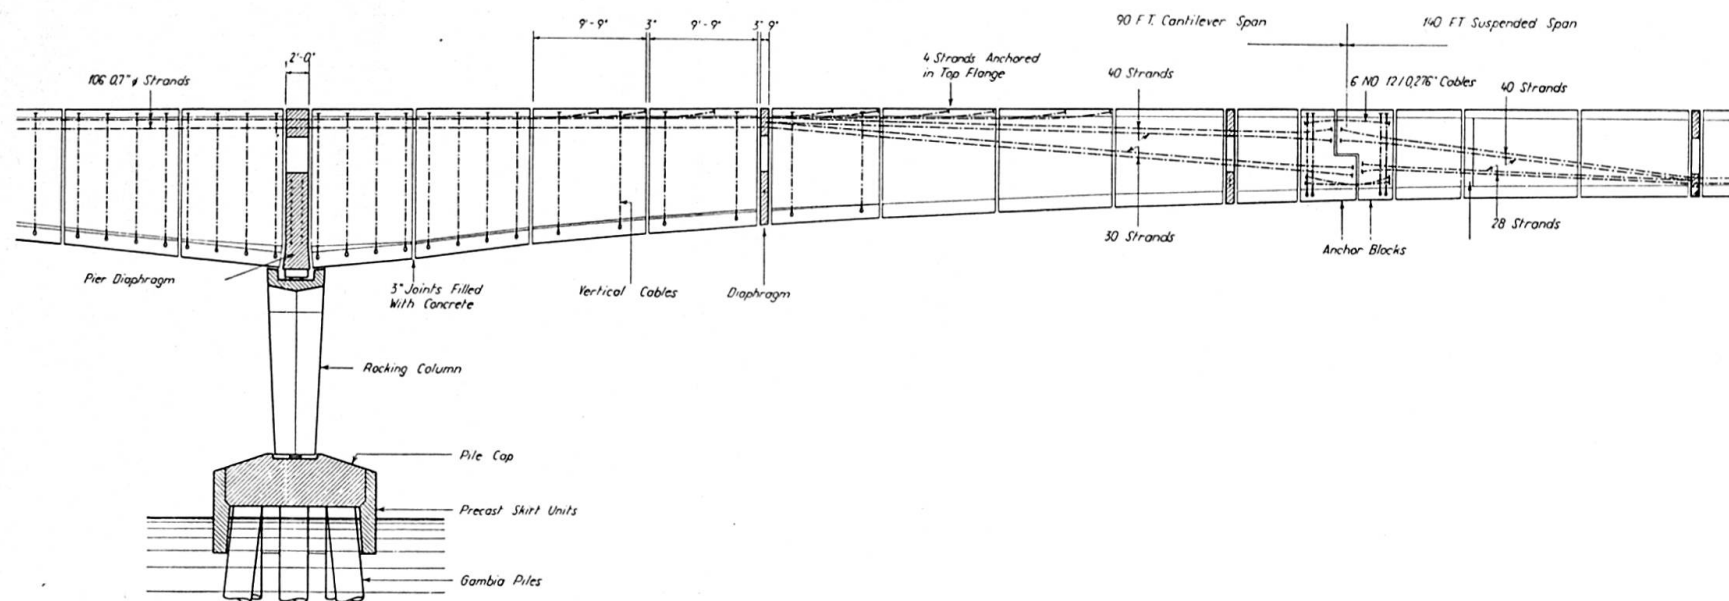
Sectional Elevation of Main Beam at River Pier.
